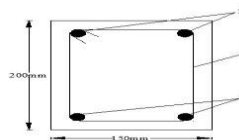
Cross section: 1 – Longitudinal rebars, 2 – close stirrups
